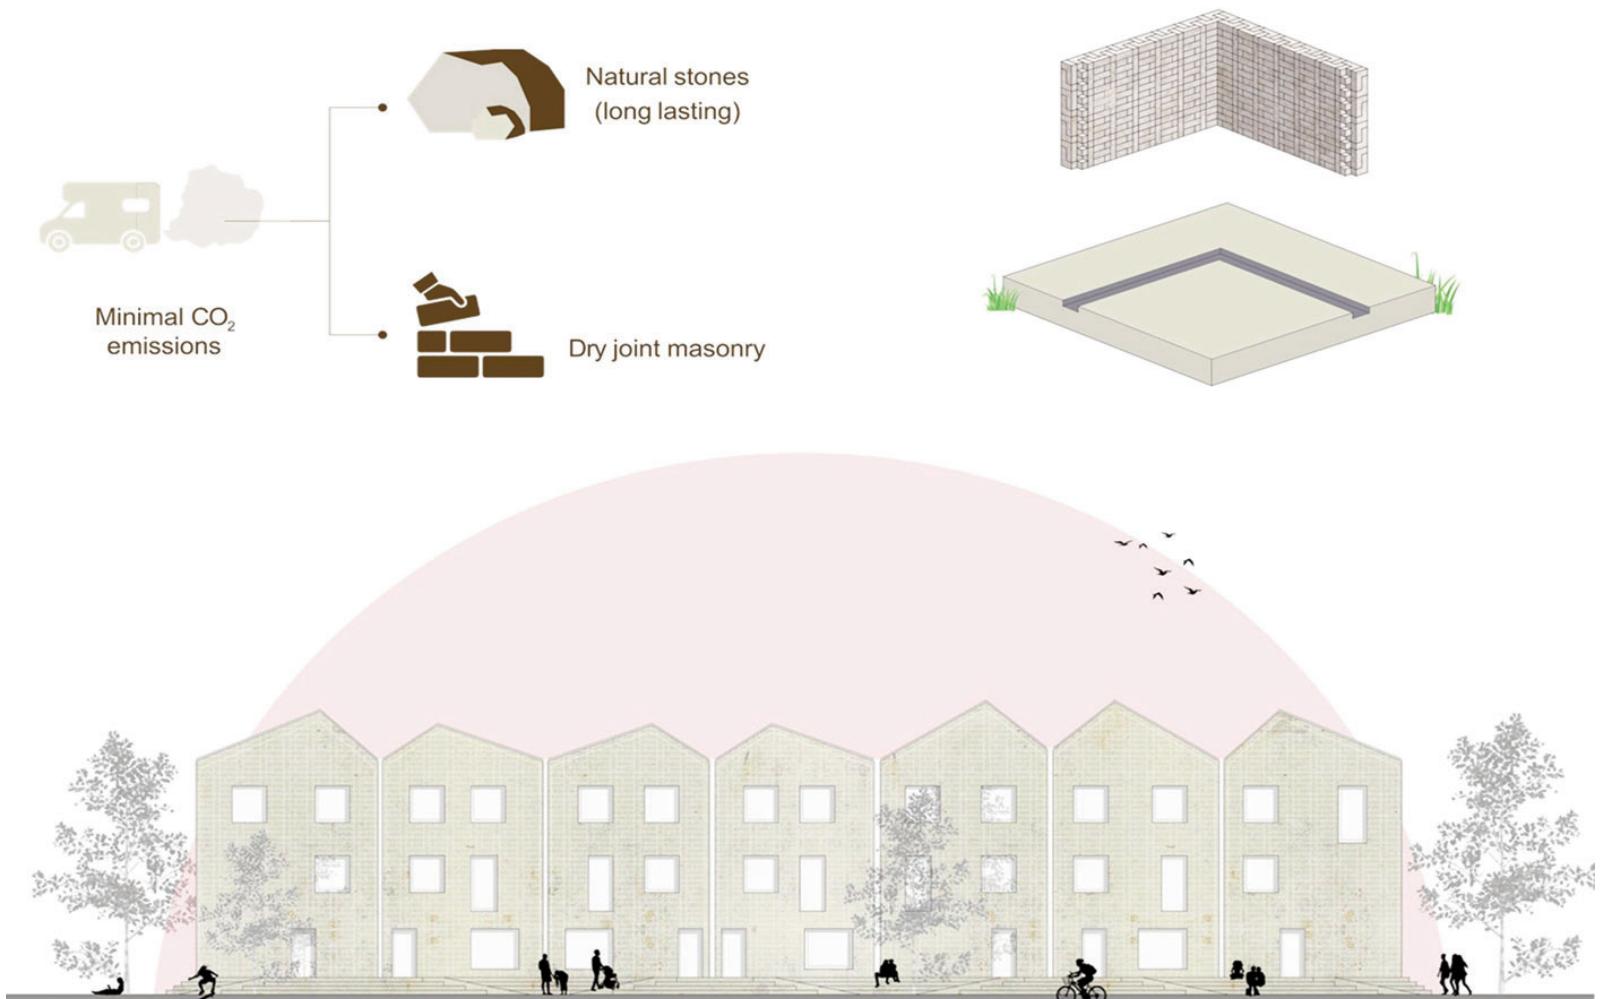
| Reversible masonry foundations, theoretical diagram (credit: T-A. Cazan, L. M. Gipp, A. Janakiev, and M. M. Trenkner, 2024).
